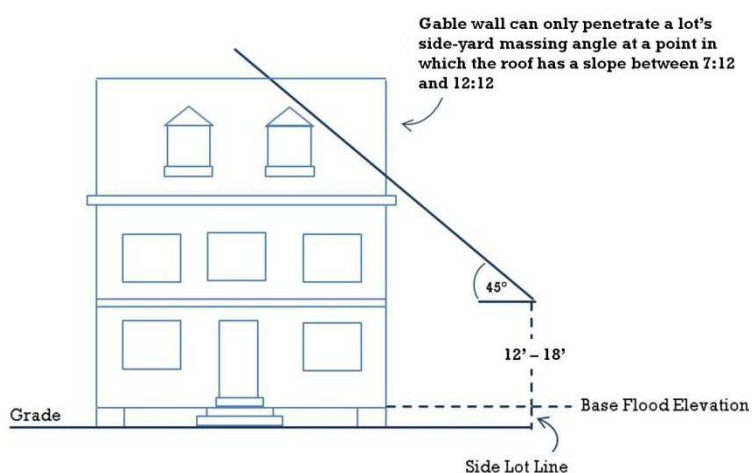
Side-Yard Massing Angle gable wall exception illustration
